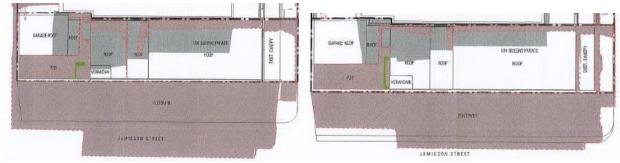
Additional overshadowing shown in green at 9am and 10am (Applicant submission – advertised plans)
